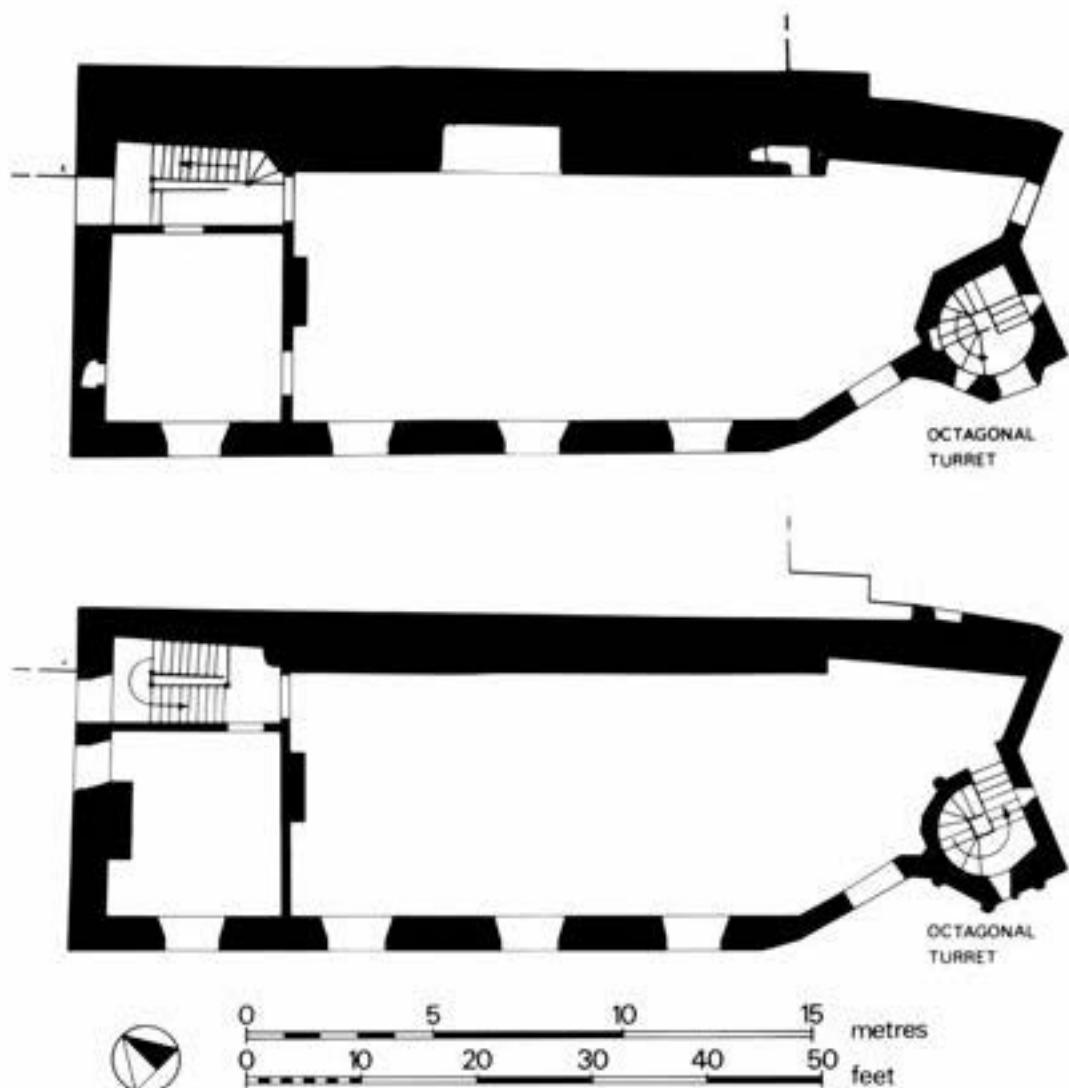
Plans of the Regimental Museum: above ground floor; below first floor
